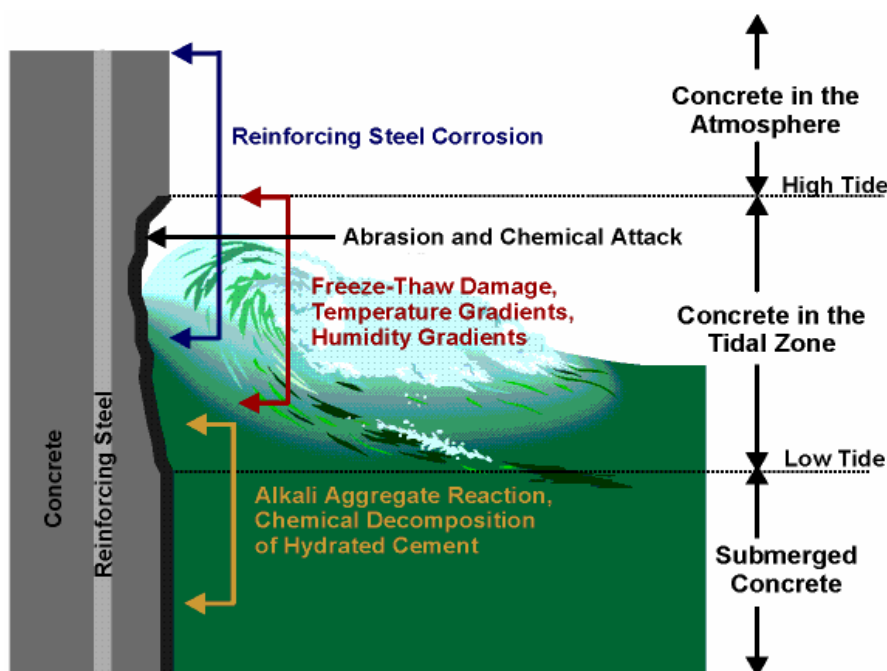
Combined mechanisms of concrete degradation exposed to marine environment.
